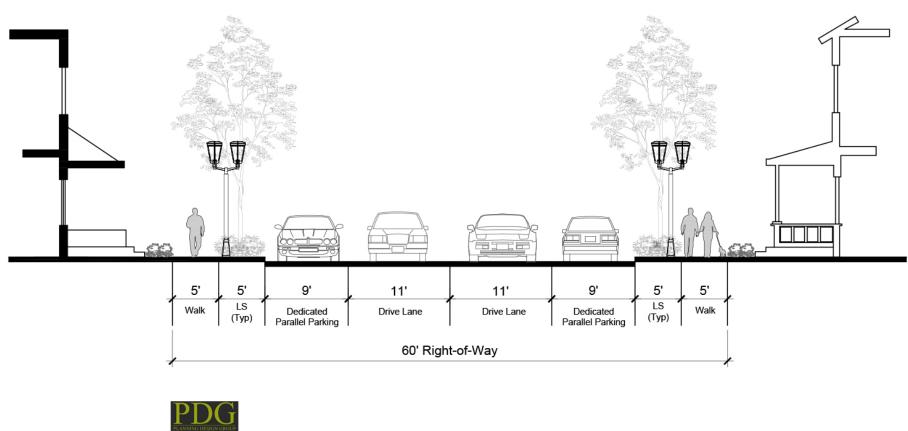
EXHIBIT J: STANDARD RESIDENTIAL STREET SECTION WITH TRAIL EDGE
